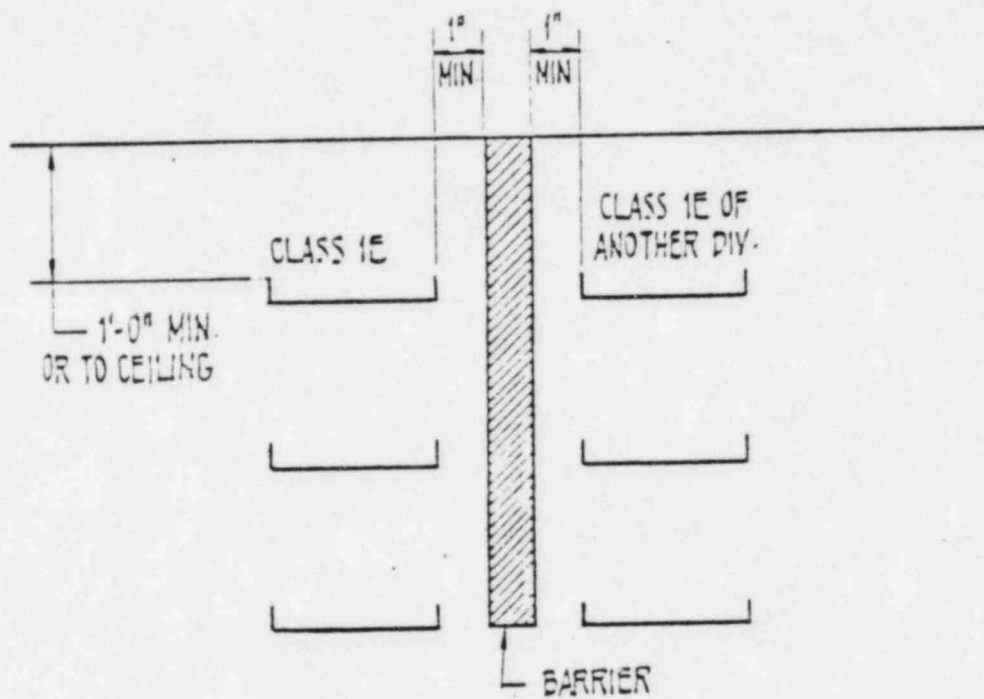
ARRANGEMENT WHEN HORIZONTAL SPATIAL SEPARATION IS NOT MAINTAINED NON-HAZARD ZONES.
